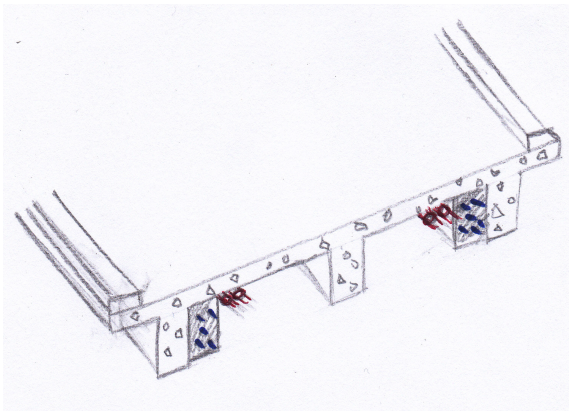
Diagram showing retrofit edge beams and tendons on underside of deck
